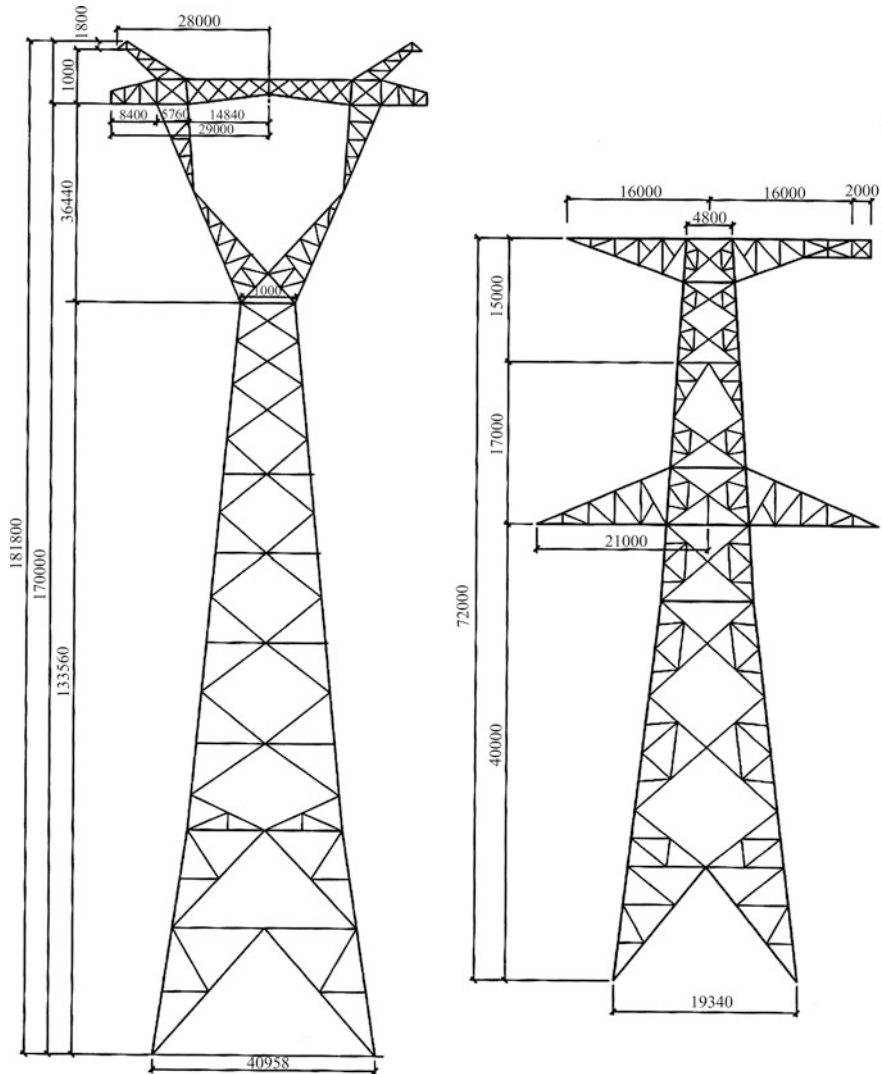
Structural diagrams for crossover tower and anchor tower of Hanjiang River large-crossing (mm)
